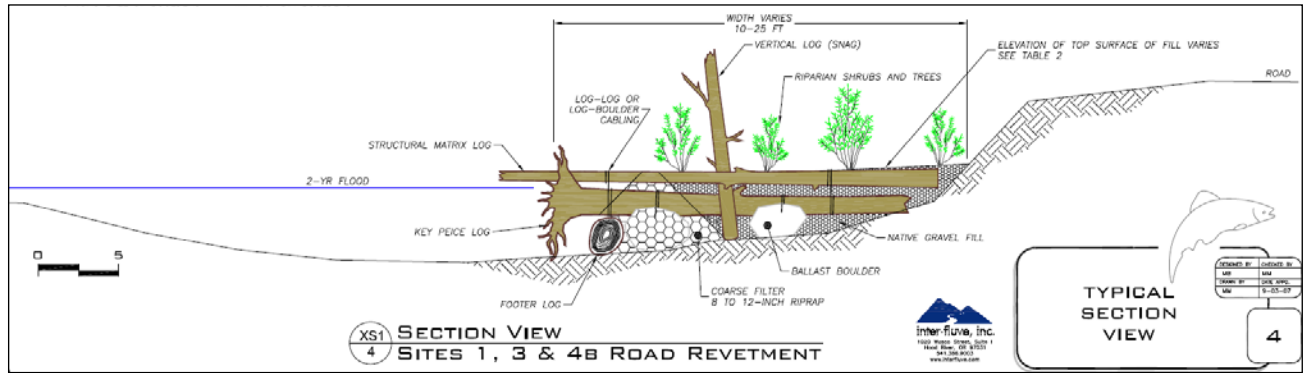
Typical design cross-section for construction of floodplain benches in the Upper Klickitat River In-Channel and Floodplain Enhancement Project (Phase 2).
